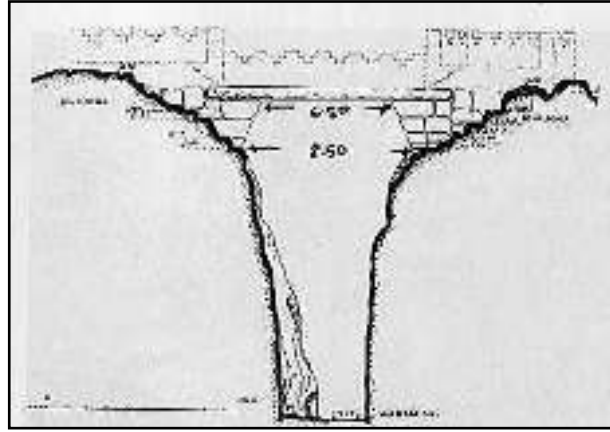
Reconstruction Drawing of Hittite Timber Bridge [11].
